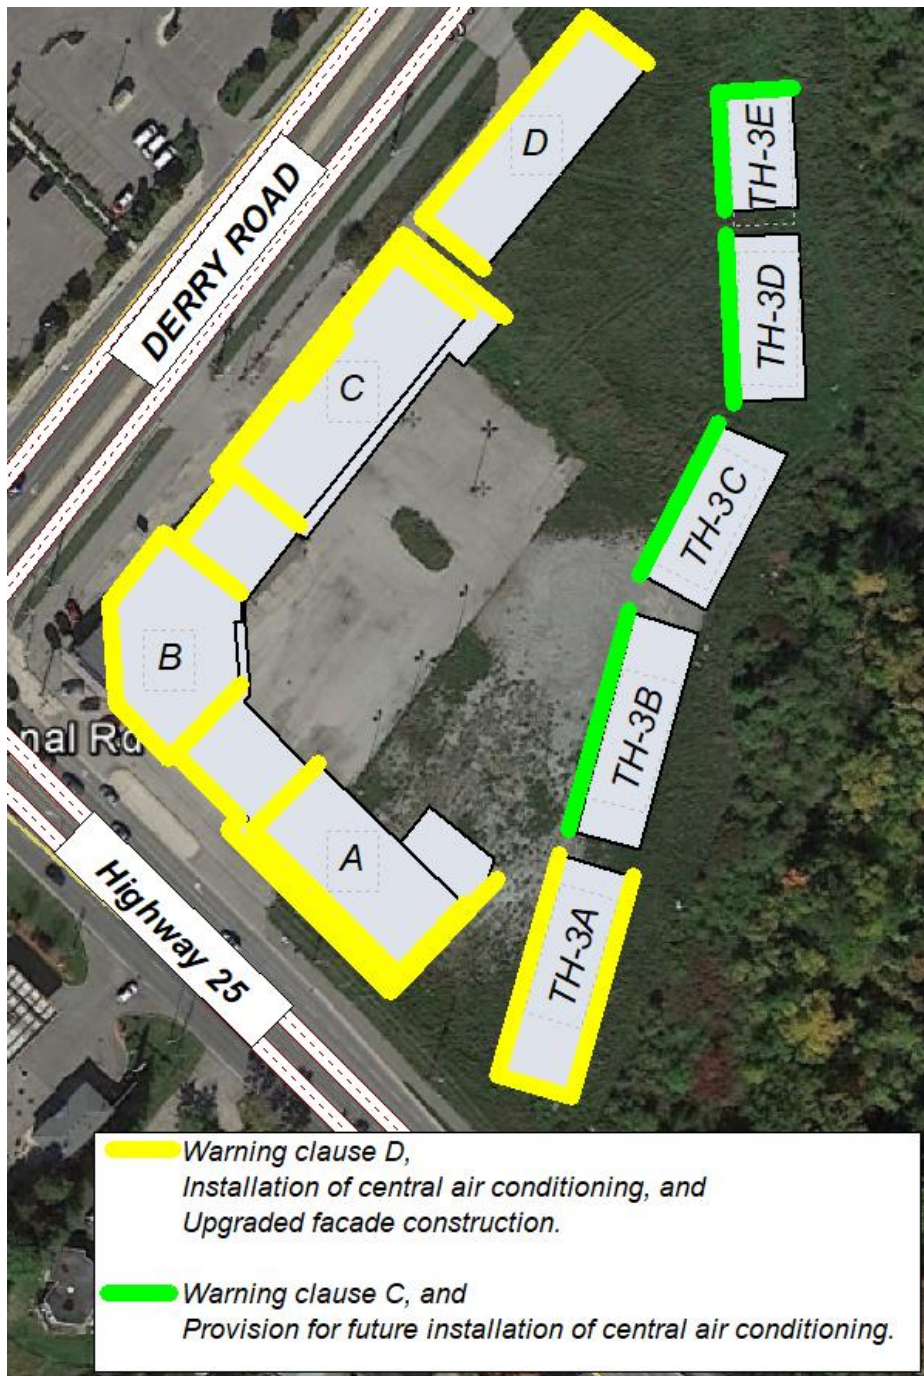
Facades Requiring Warning Clauses and Upgraded Façade Construction
